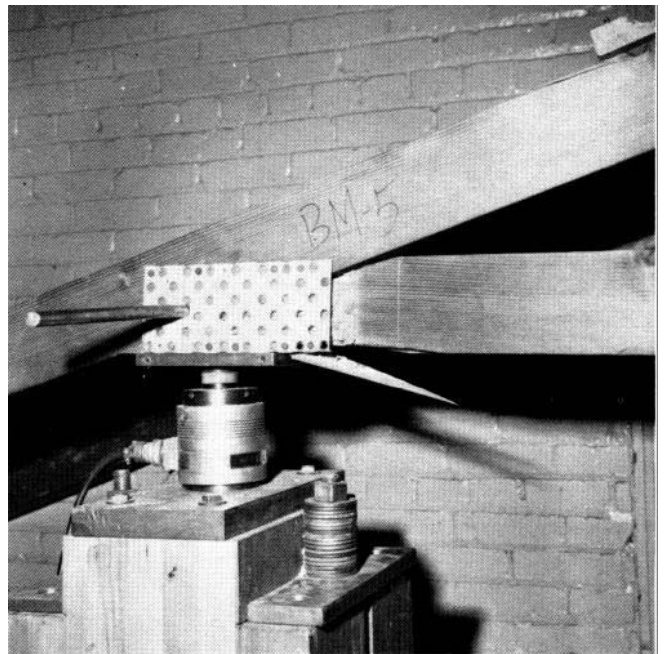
Failure of 5-year-old barbed metal-plate gusset trussed rafter in heel joint. (M140589-9)
